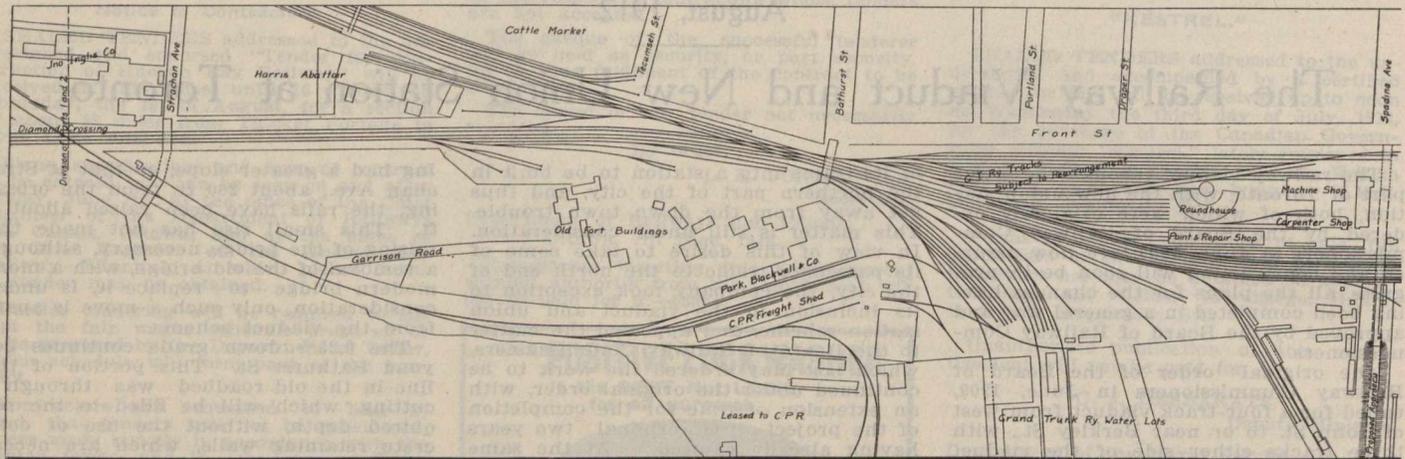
Sec. 1. Plan of Viaduct Scheme from C.P.R. Diamond Crossing to Spadina Ave.
